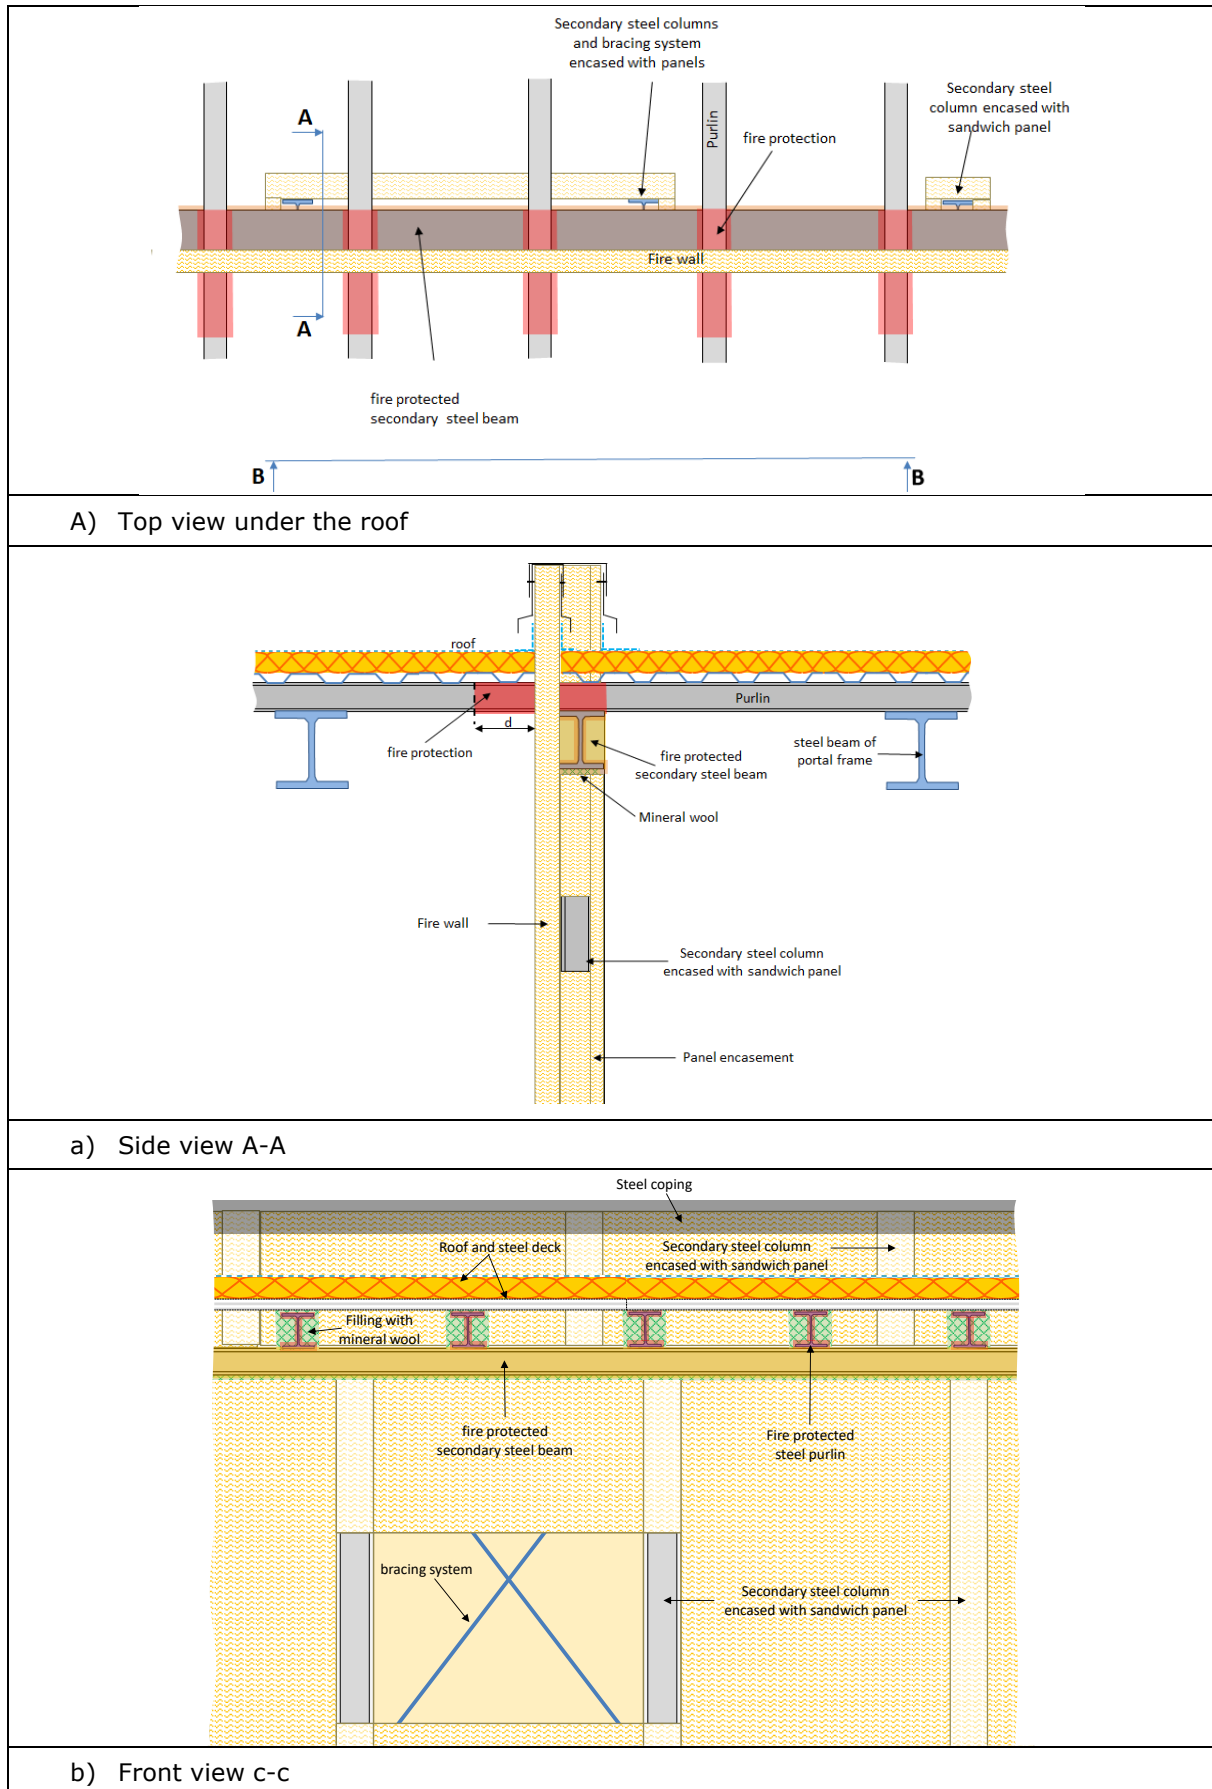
Schematic views for a fire wall parallel to portal frames, placed between portal frames and extending beyond the roof
